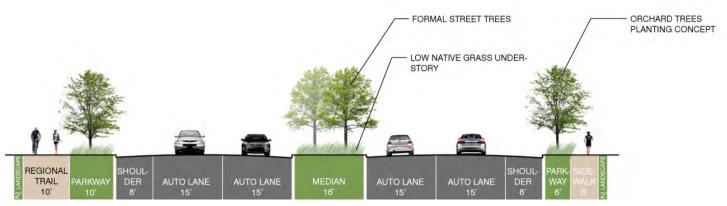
Urban/Rural Transition Boulevard Cross Section Type 7
